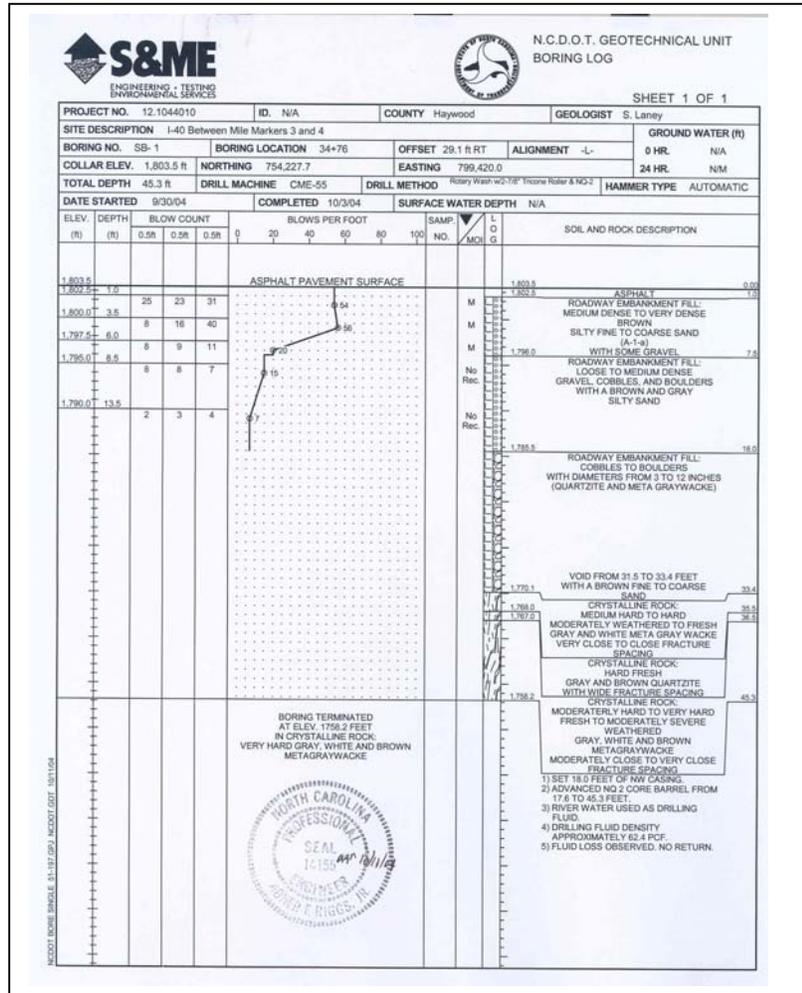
Soil Boring from Site #1 (Slide near the Tunnel)
